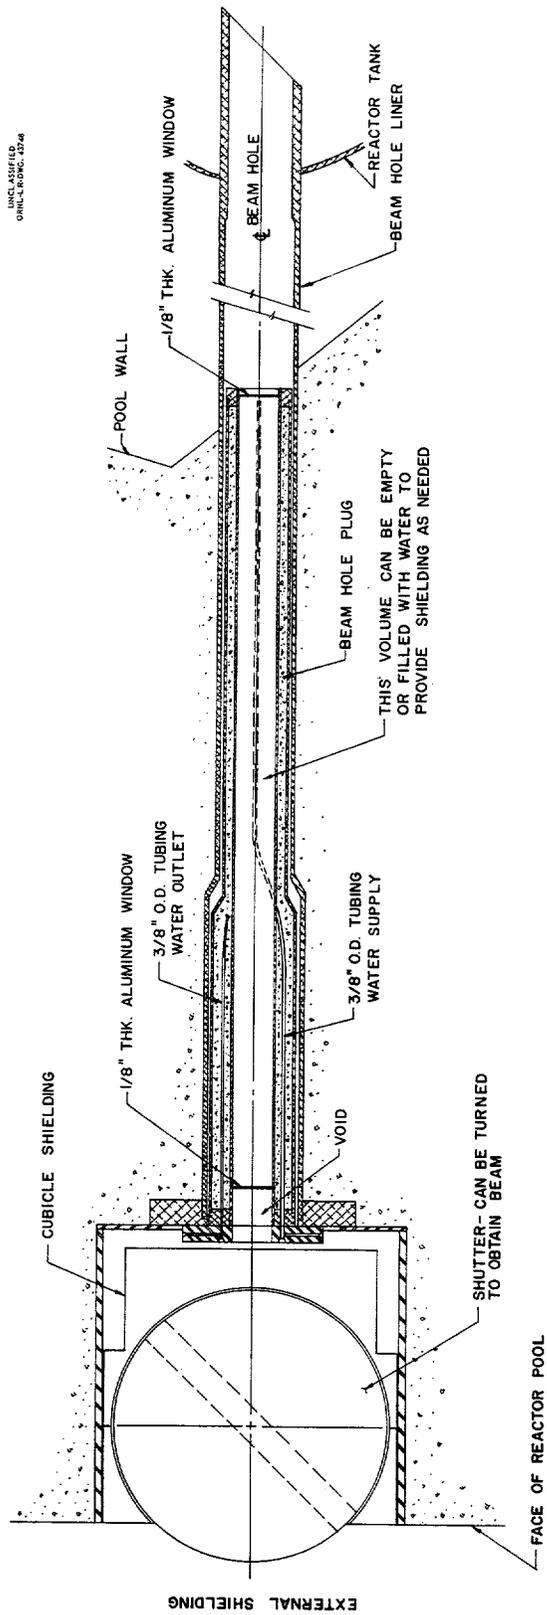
Section Through Beam Hole No. 6 and Modified Plug.
